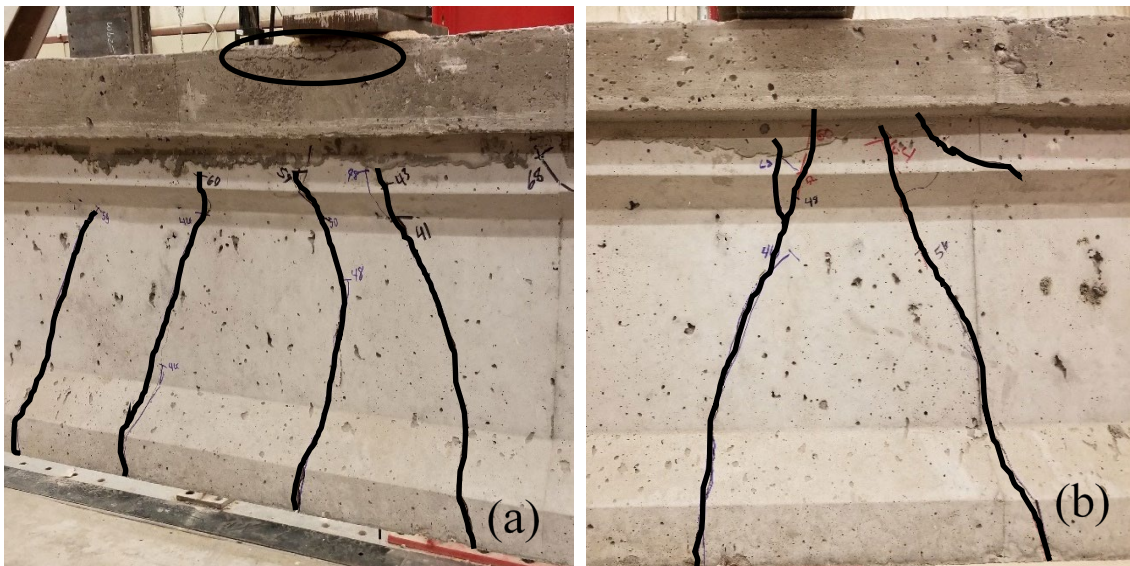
Crushed concrete deck in the NC3-N girder is indicated by a black oval (a) and the final flexural cracking under the load point in the NC3-N (a) and NC3-S (b) girders are indicated by dark lines.
